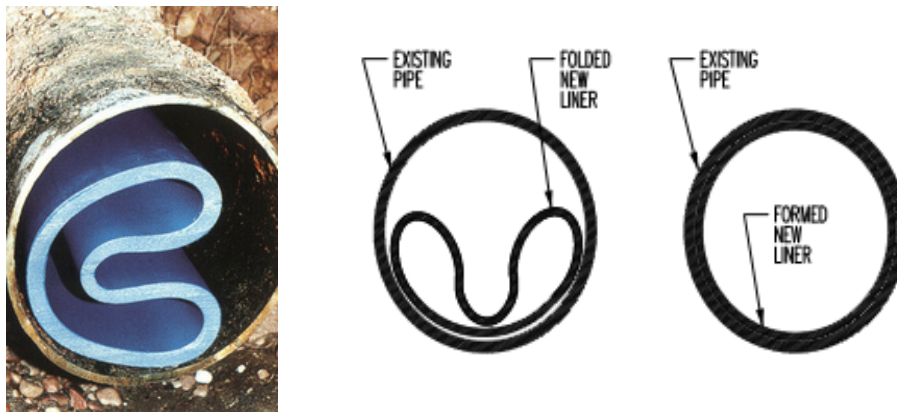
and 6: Real deformed pipe-liner [32] and deformed and reformed liners [14]
